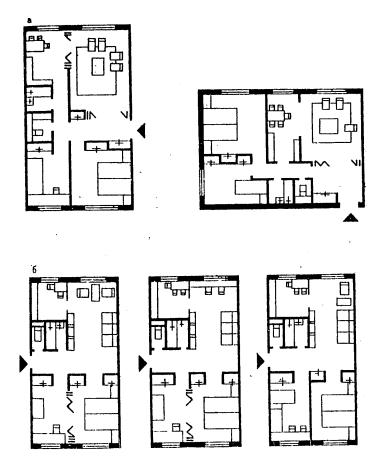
Floor plans for apartments with room conversion. a--Combination of adjacent rooms; b--varying the floor plan of the apartment as a function of the family composition.
